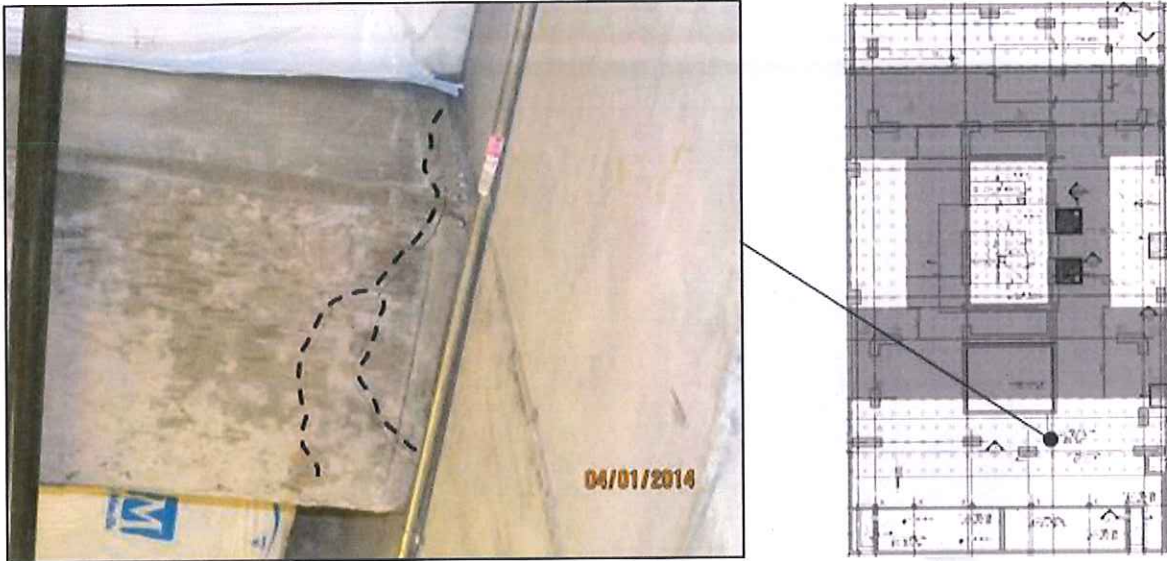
Diagonal crack in moment frame beam, Line H near beam-column connection
